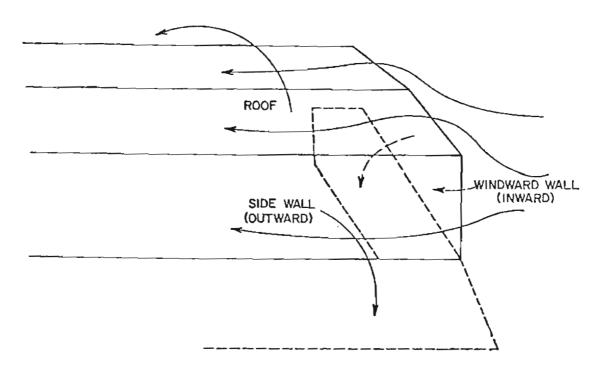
WIND-INDUCED PRESSURE ON WINDWARD WALL CAUSED FAILURE OF MASONRY. Concrete block and brick wall fell inward.
